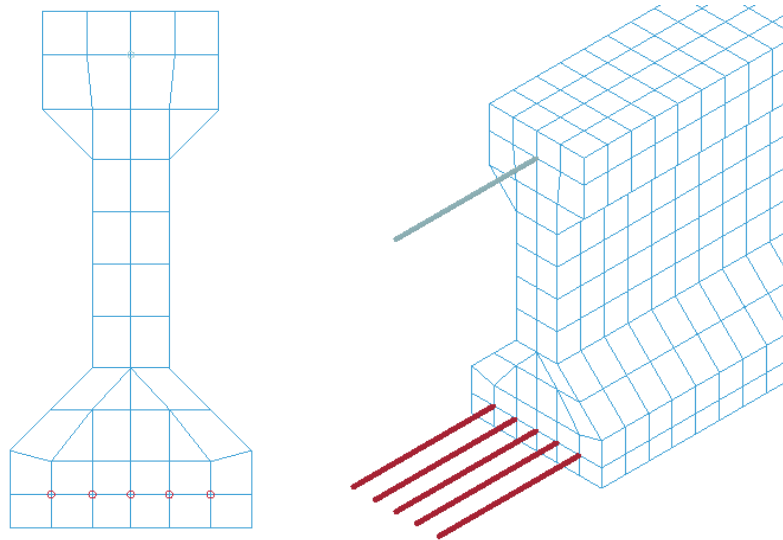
Zoom-In View of Strands at the Mid-Span of The Girder of Archetype 2 Bridge.
